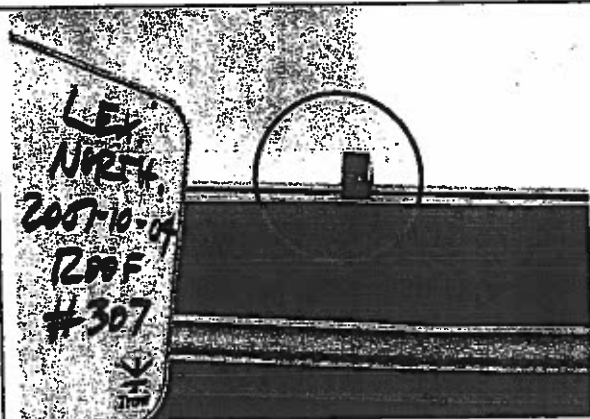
Unit #307 roof top stairwell: note missing rain water leader.
